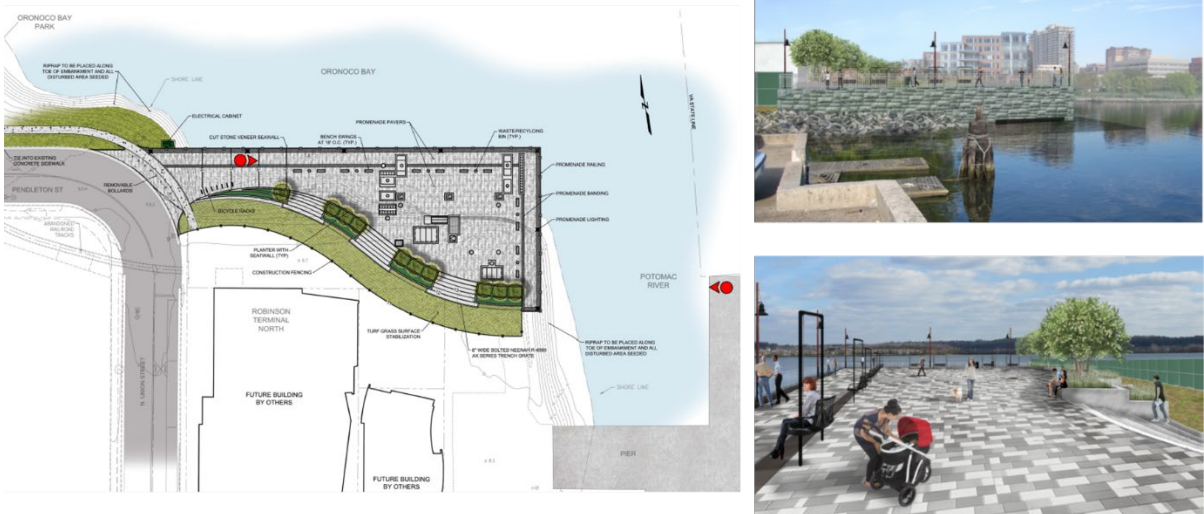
RTN Alternative Conceptual Landscape Plan and Renderings
